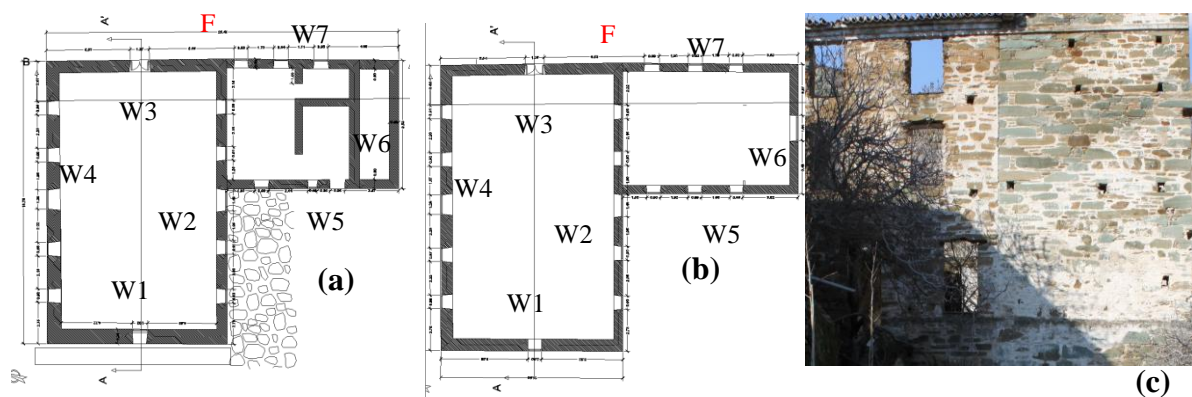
Plans at levels $z= 11.22\text{m}$ a), $z=13.96\text{m}$ b) and a picture taken from point F which shows the lack of connection among the buildings (c)
